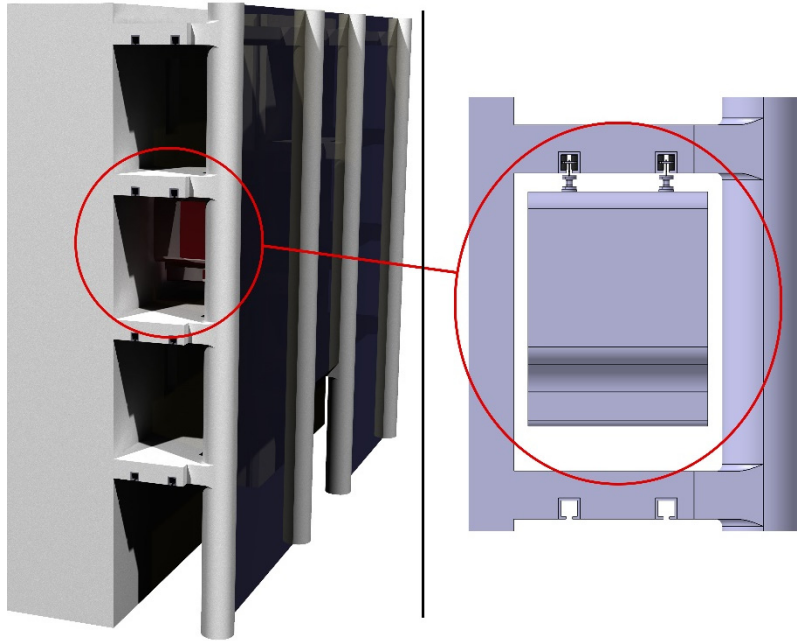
Building concept with elevator facade – suspension via trolleys (concept 1).
